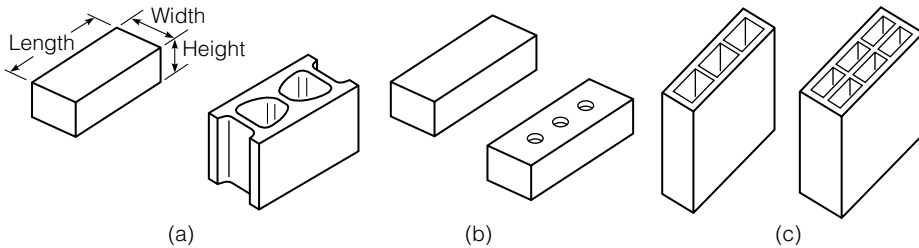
Examples of masonry units: (a) concrete masonry units, (b) clay bricks, and (c) structural clay tiles
